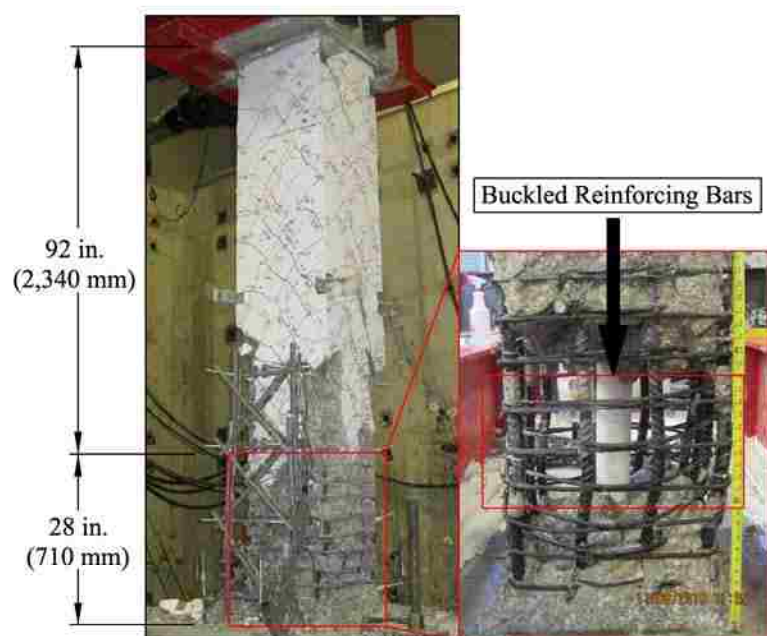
Damage to Column 3 ($T/M=0.4$).
